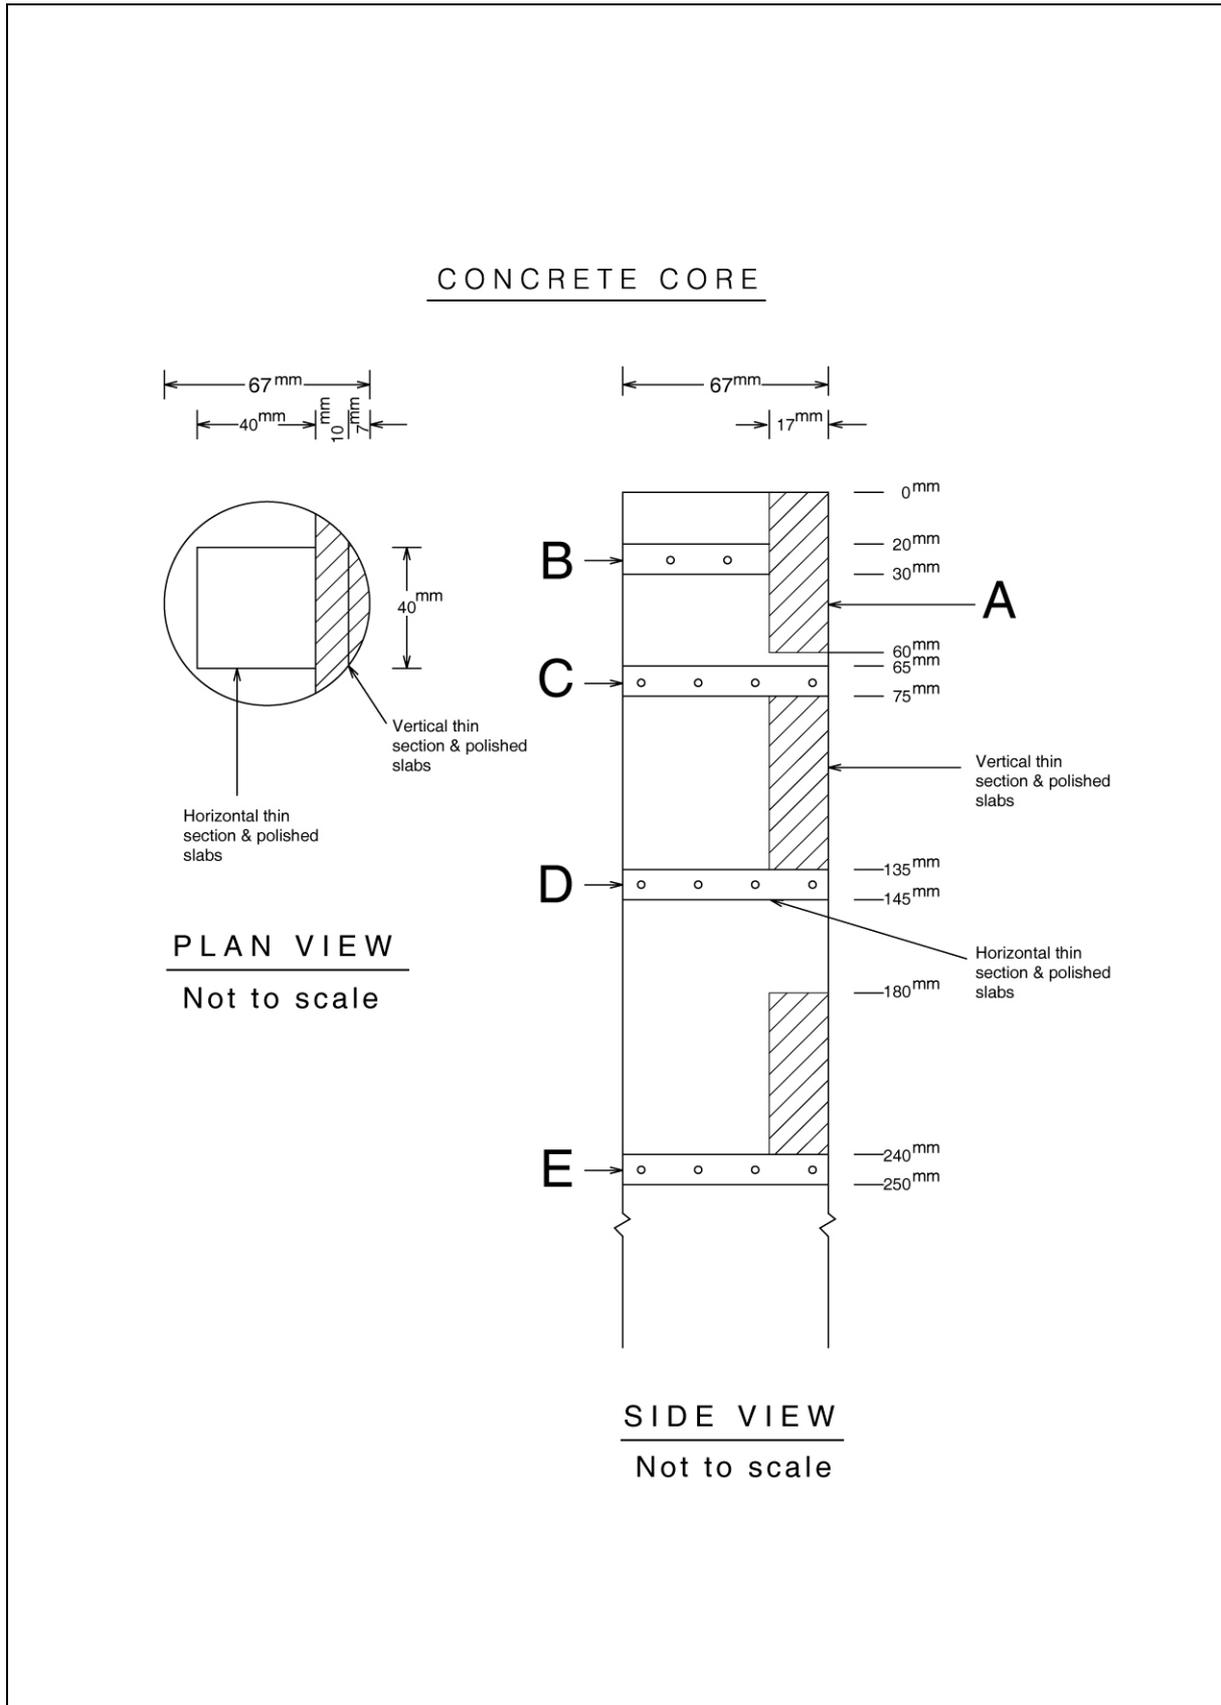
General Orientation of Concrete Thin Section and Polished Slab Specimens Taken from Corehole Samples
